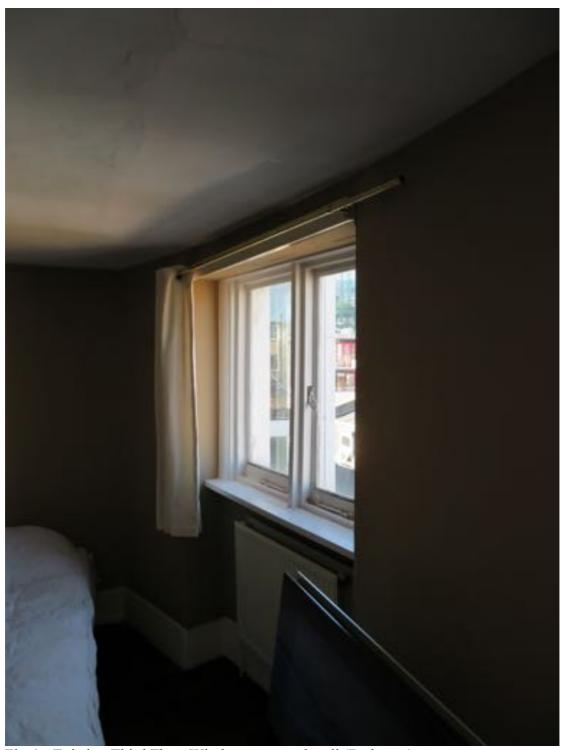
Existing Third Floor Window to curved wall (Bedroom)
